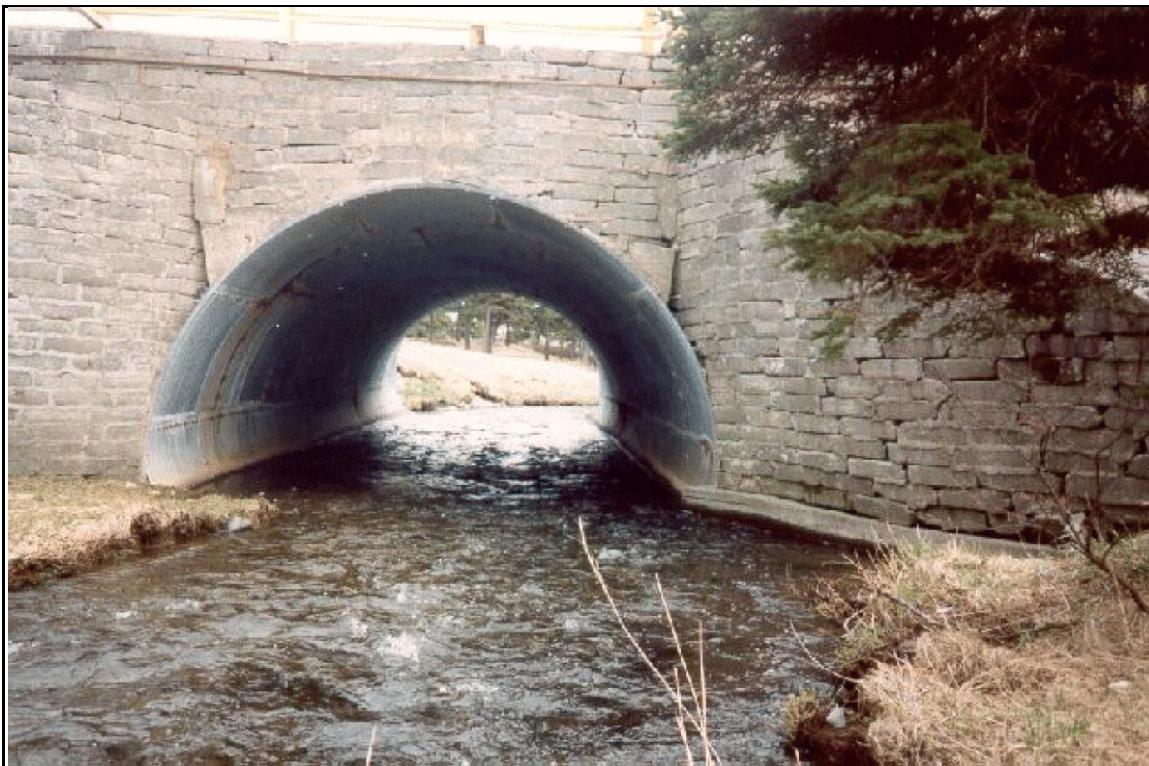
Pipe Arch Culvert with Masonry Headwall and Wingwalls
